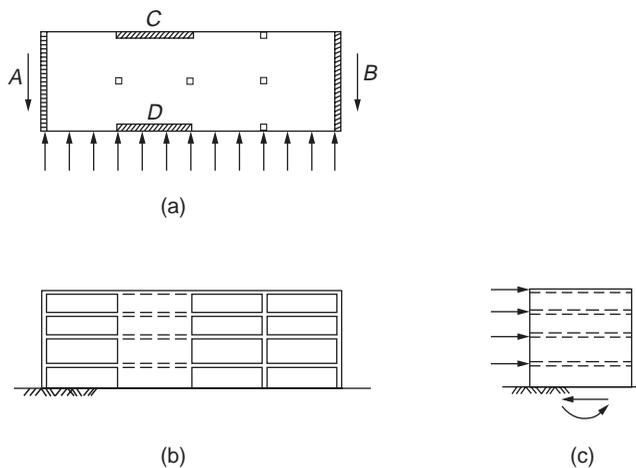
Building with shear walls subject to horizontal loads: (a) typical floor; (b) front elevation; (c) end elevation.
